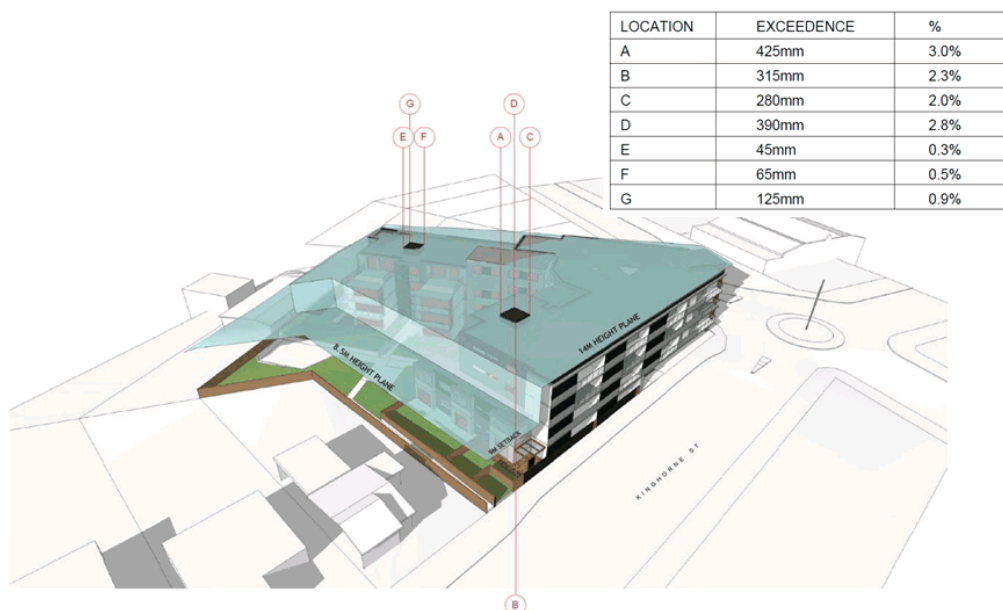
Height plane instructions relating to the 14.0m (N2) maximum building height - south-eastern view from Kinghorne Street.
